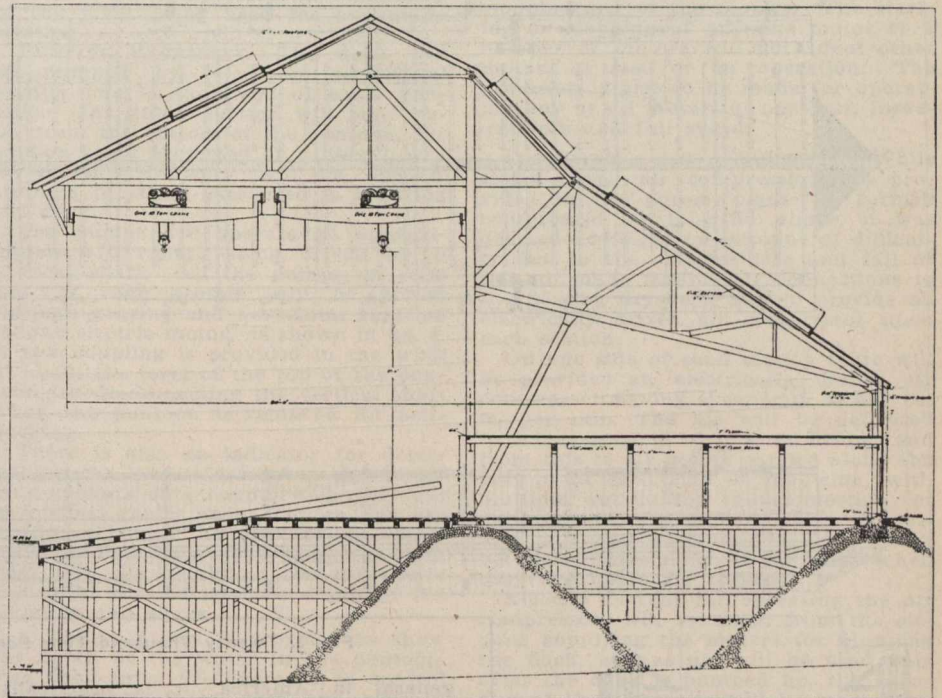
Cross Section of Ship Shed, Prince Rupert.
